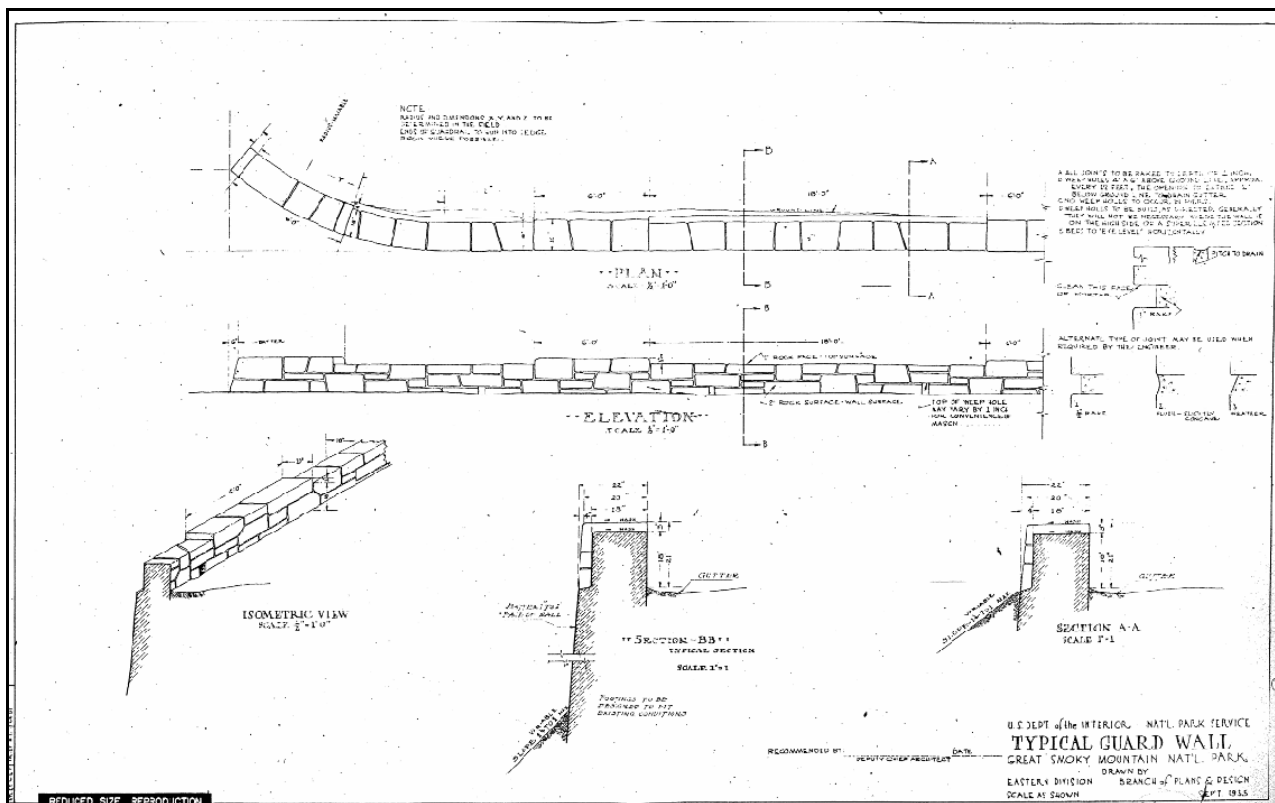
"Typical Guard Wall," (General Construction Notes, 1935).
